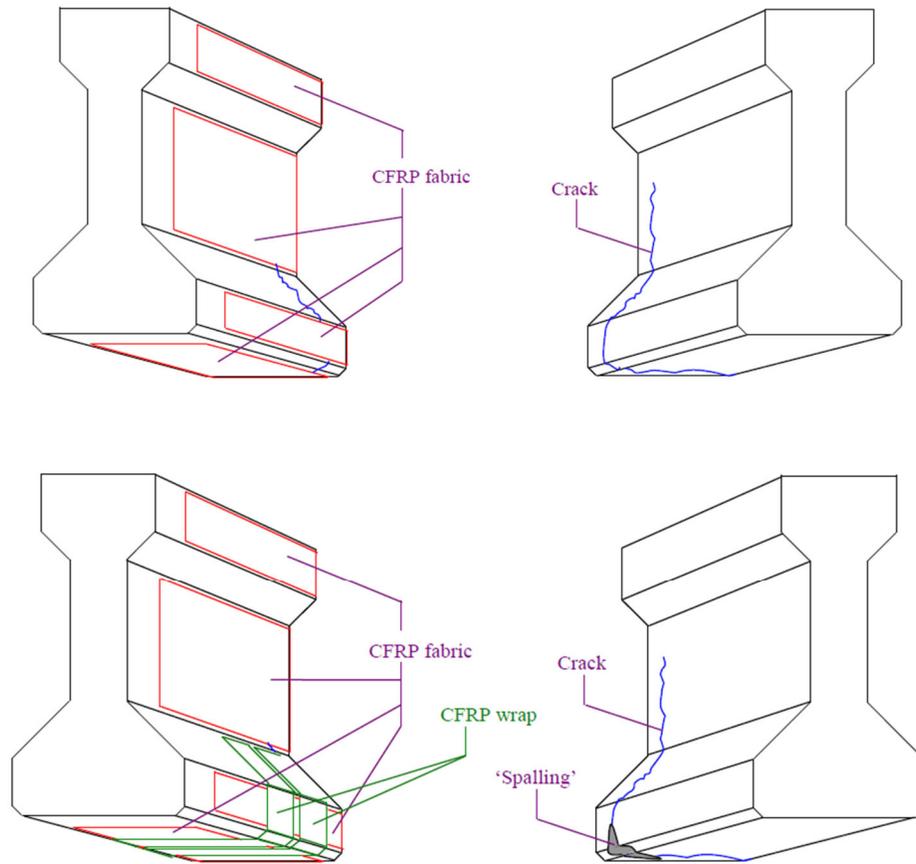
schematic of the repair schemes used for cracked PC girders and girders with cracks and spalling [29]
